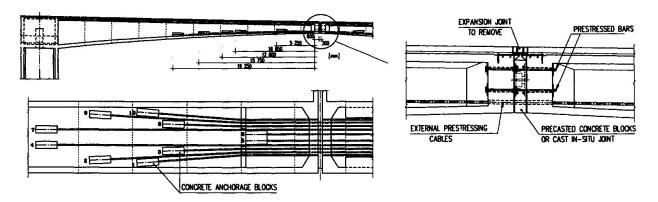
Design solution for a continuos joint: external cables layout and prestressing bars.
